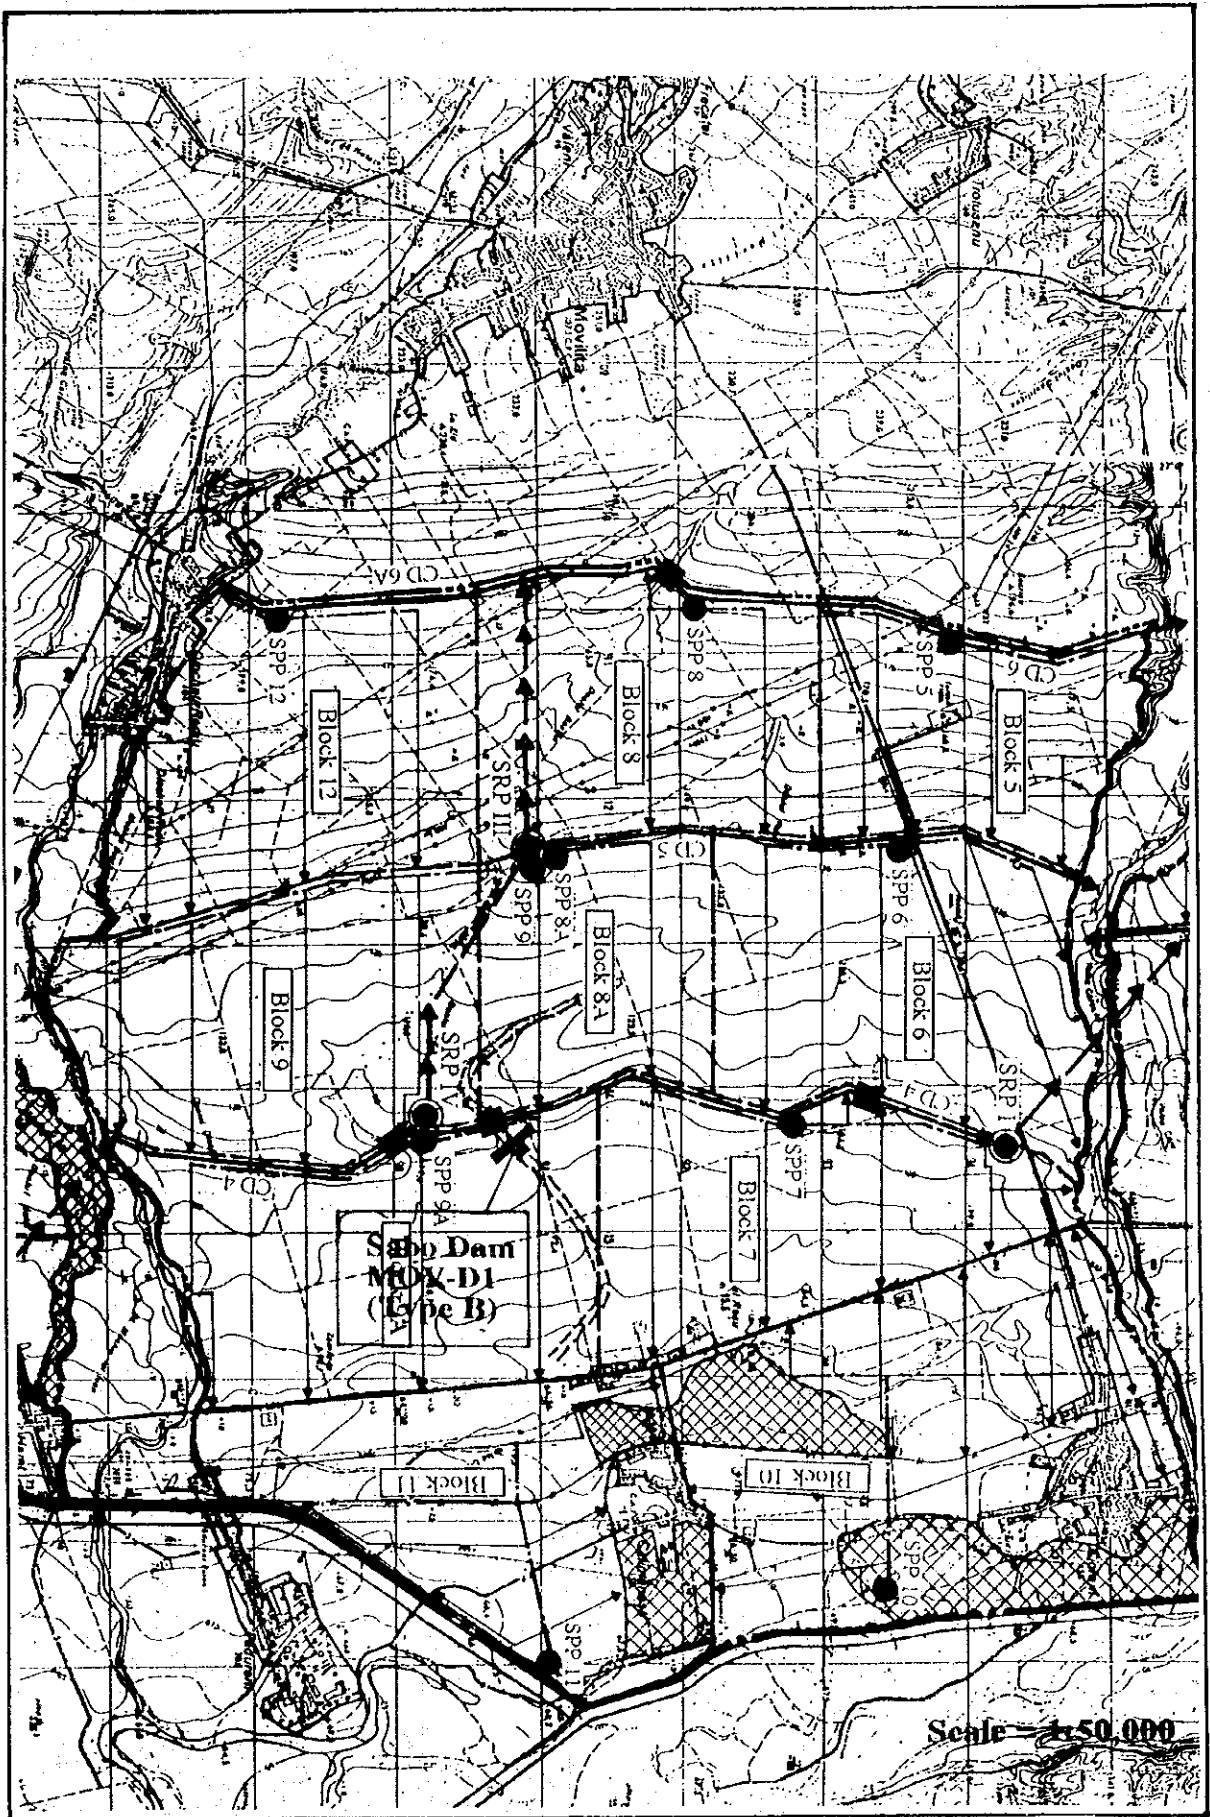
A3 Proposed Sabo Dam Site in Movilita SPCA
